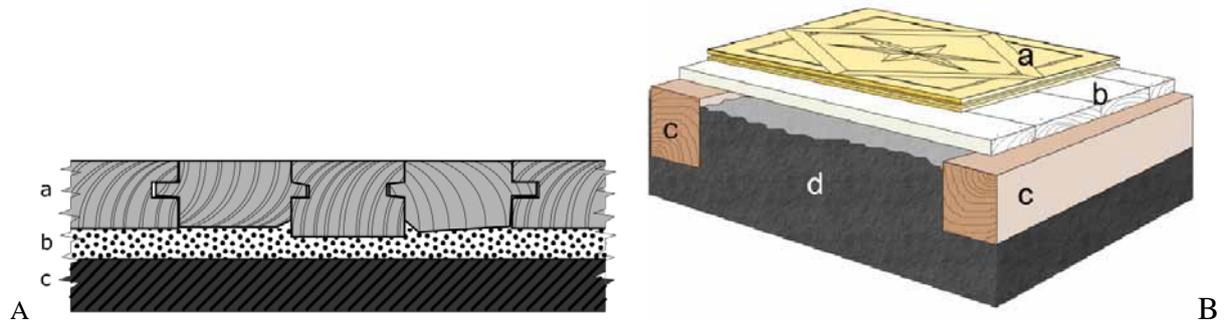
Manner of flooring installation in the Chapel (A: a – tile, b – sand, c - concrete) and the manner of flooring installation in the Ball Room (B: a – tile, b – boarding, c - ceiling beams, d – sand)
